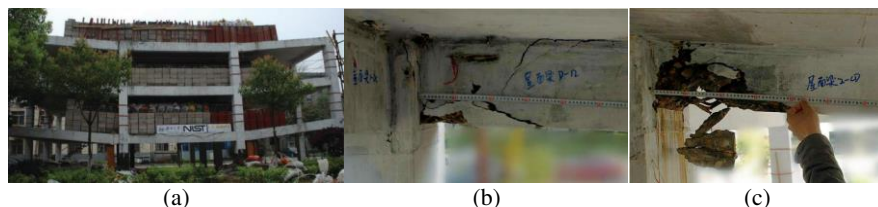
Collapse test of the RC structure after two side column removal: (a) failure mode; (b) damage at the end of one longitudinal beam; and (c) damage at the end of one transverse beam (Xiao *et al.*, 2015).
